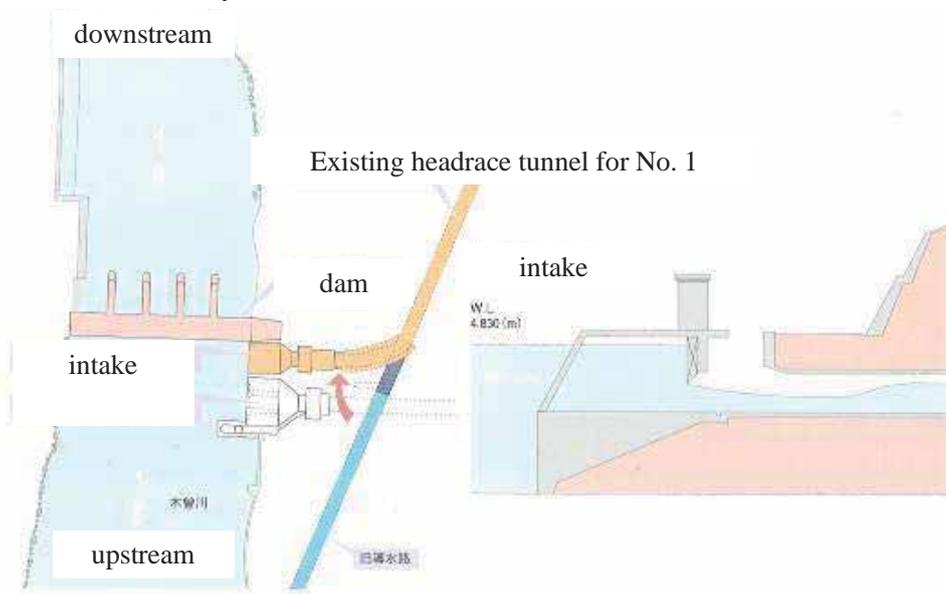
Plan and Cross-section of Yomikaki Power Station
